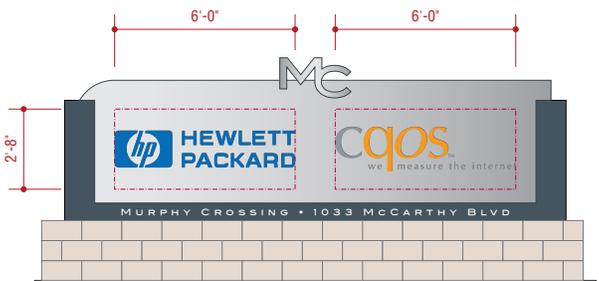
Tenant occupying Building A (left) or Building B (right)
